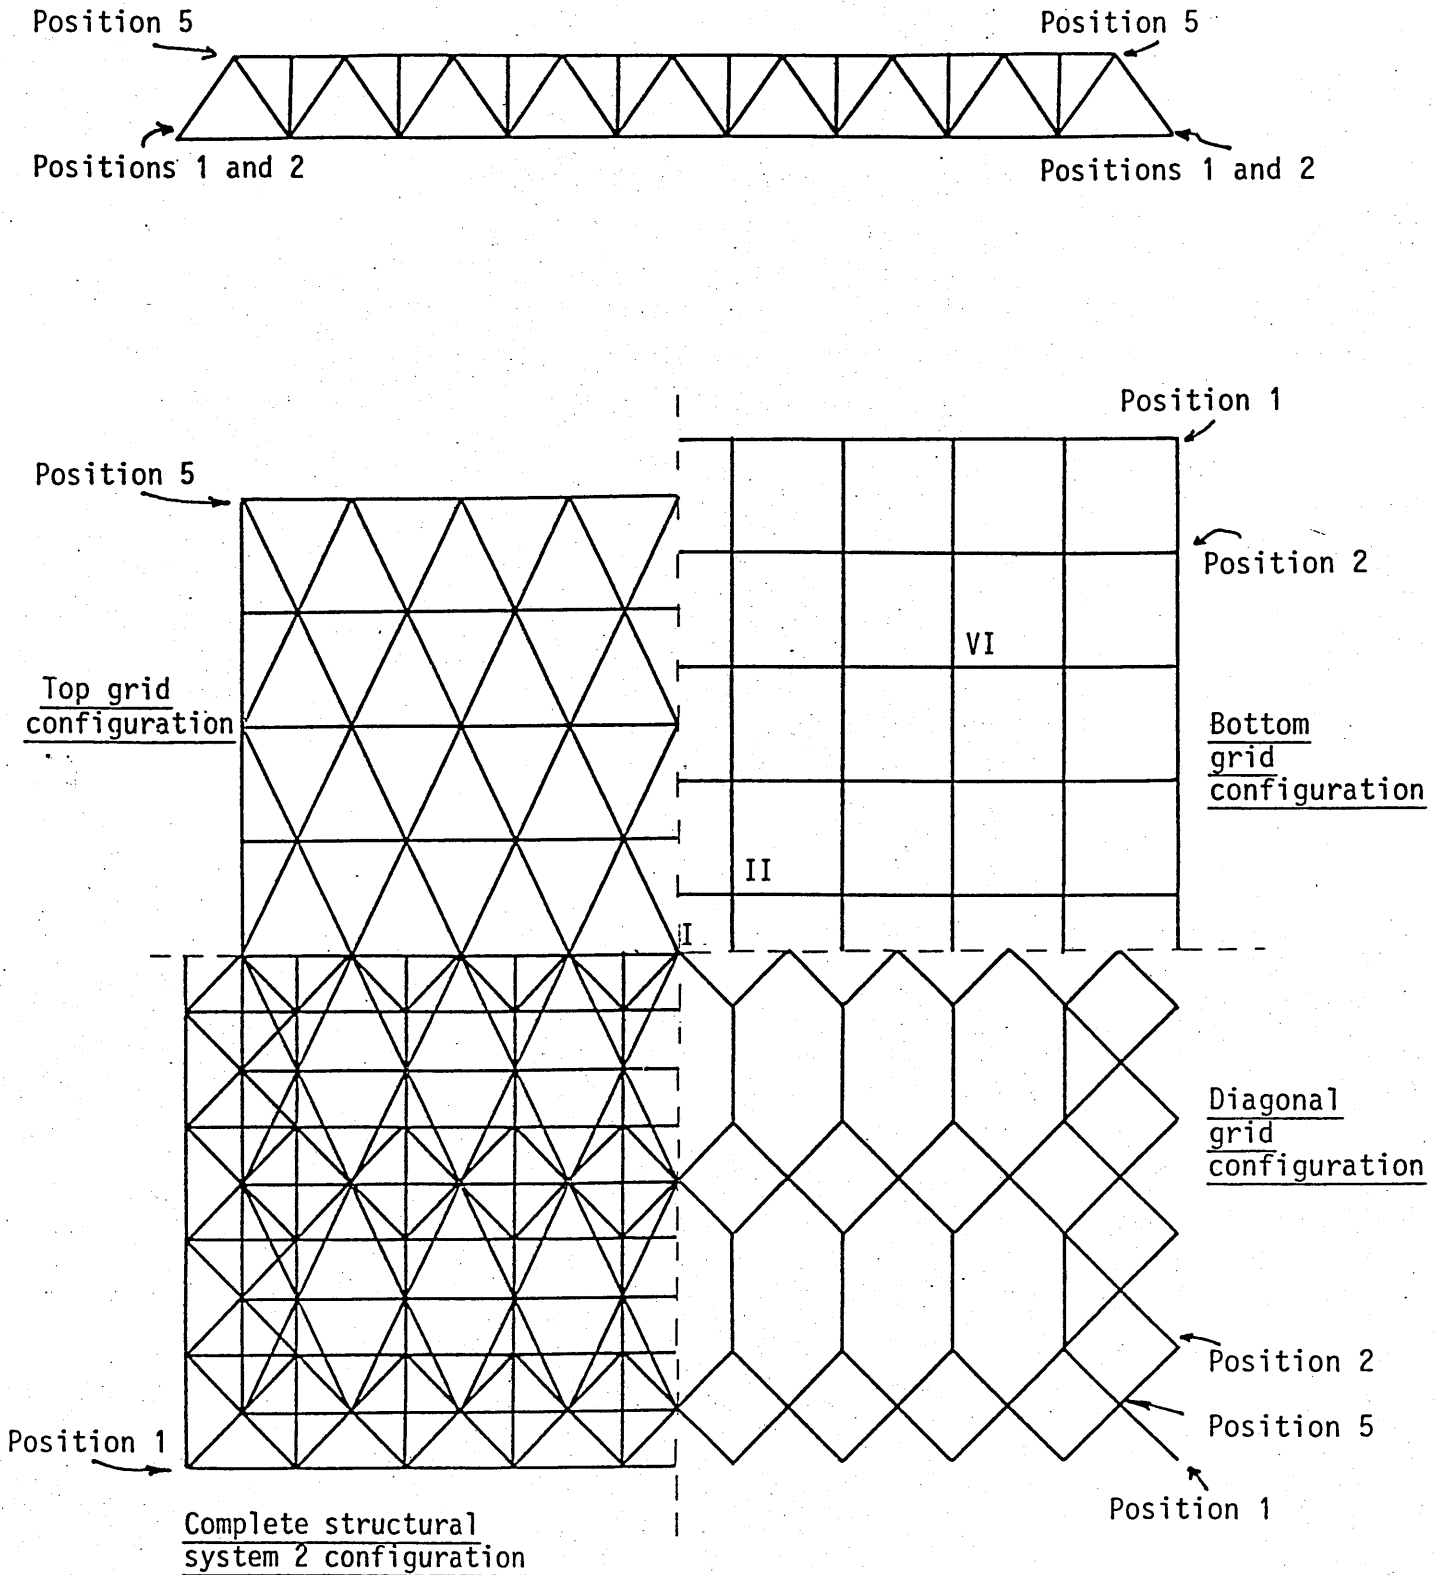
Skeletal Structural System 2. Plan showing the separate layer configurations
